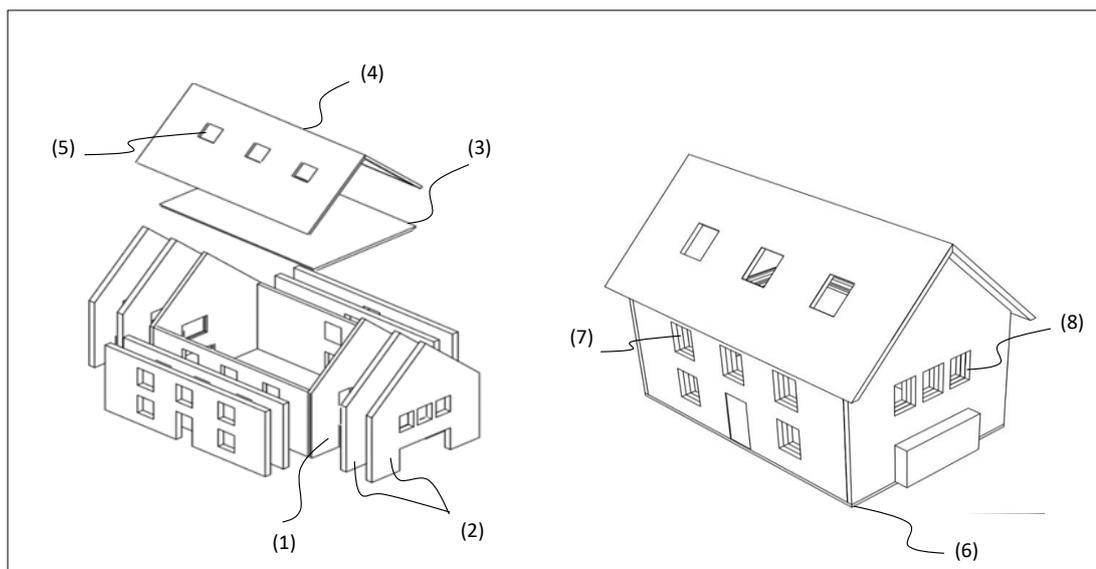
A 3D example of the disassembled building model showing examples of insulation layers and the assembled layered modular building model.
